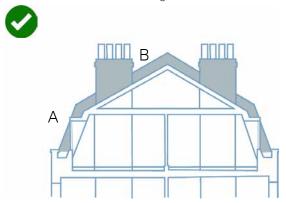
Diagram showing dormers that are obscured behind the parapet wall from the street below, Maida Hill
